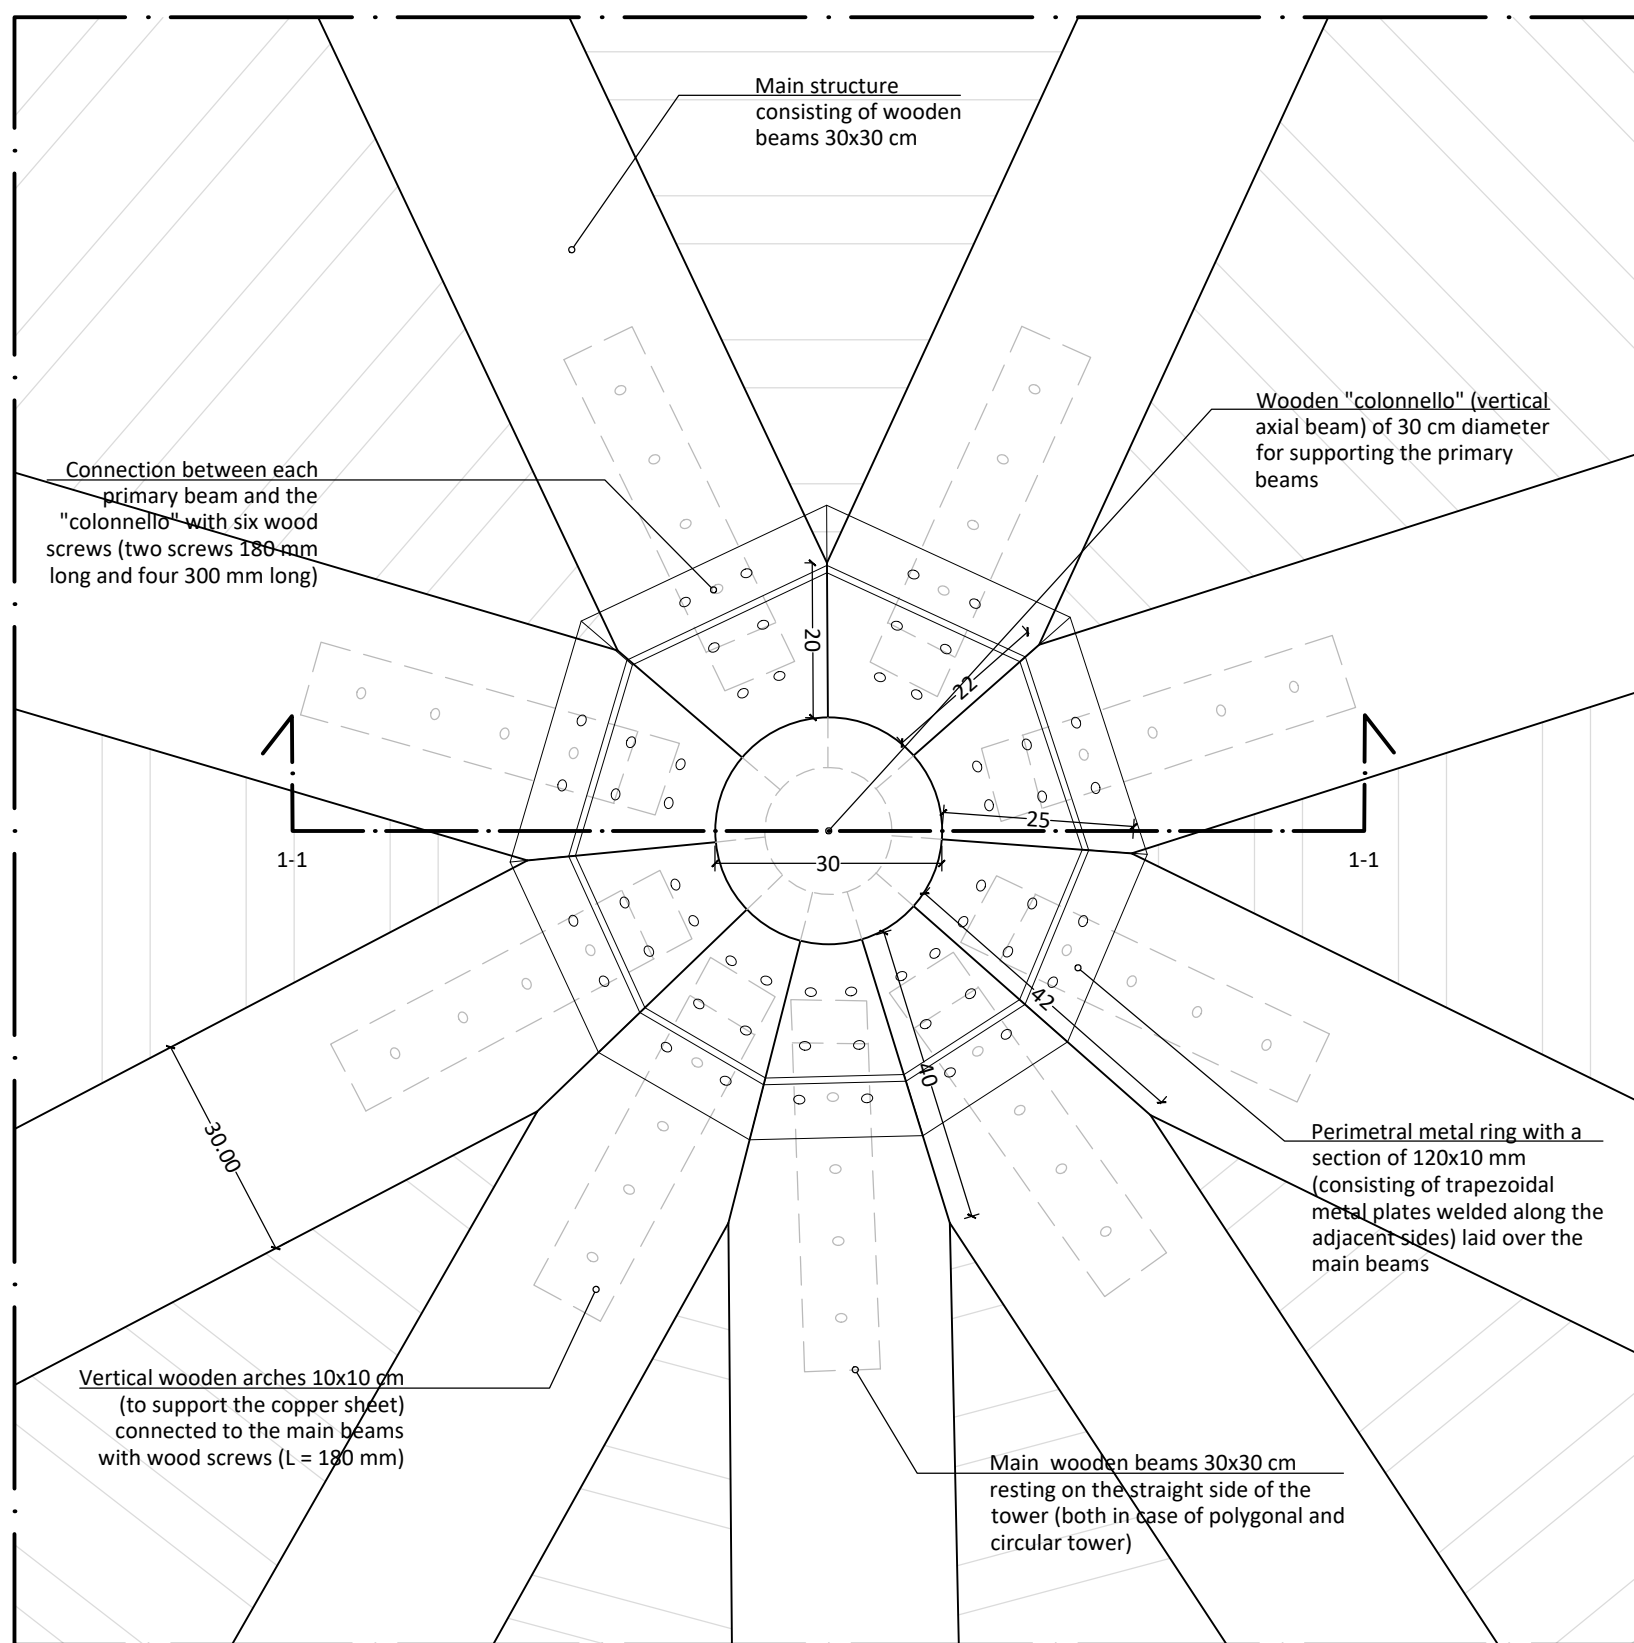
PLAN OF THE HIGHEST LEVEL OF TOWER A6 WITH INDICATION OF THE NEW ROOF STRCTURE - 1:50
